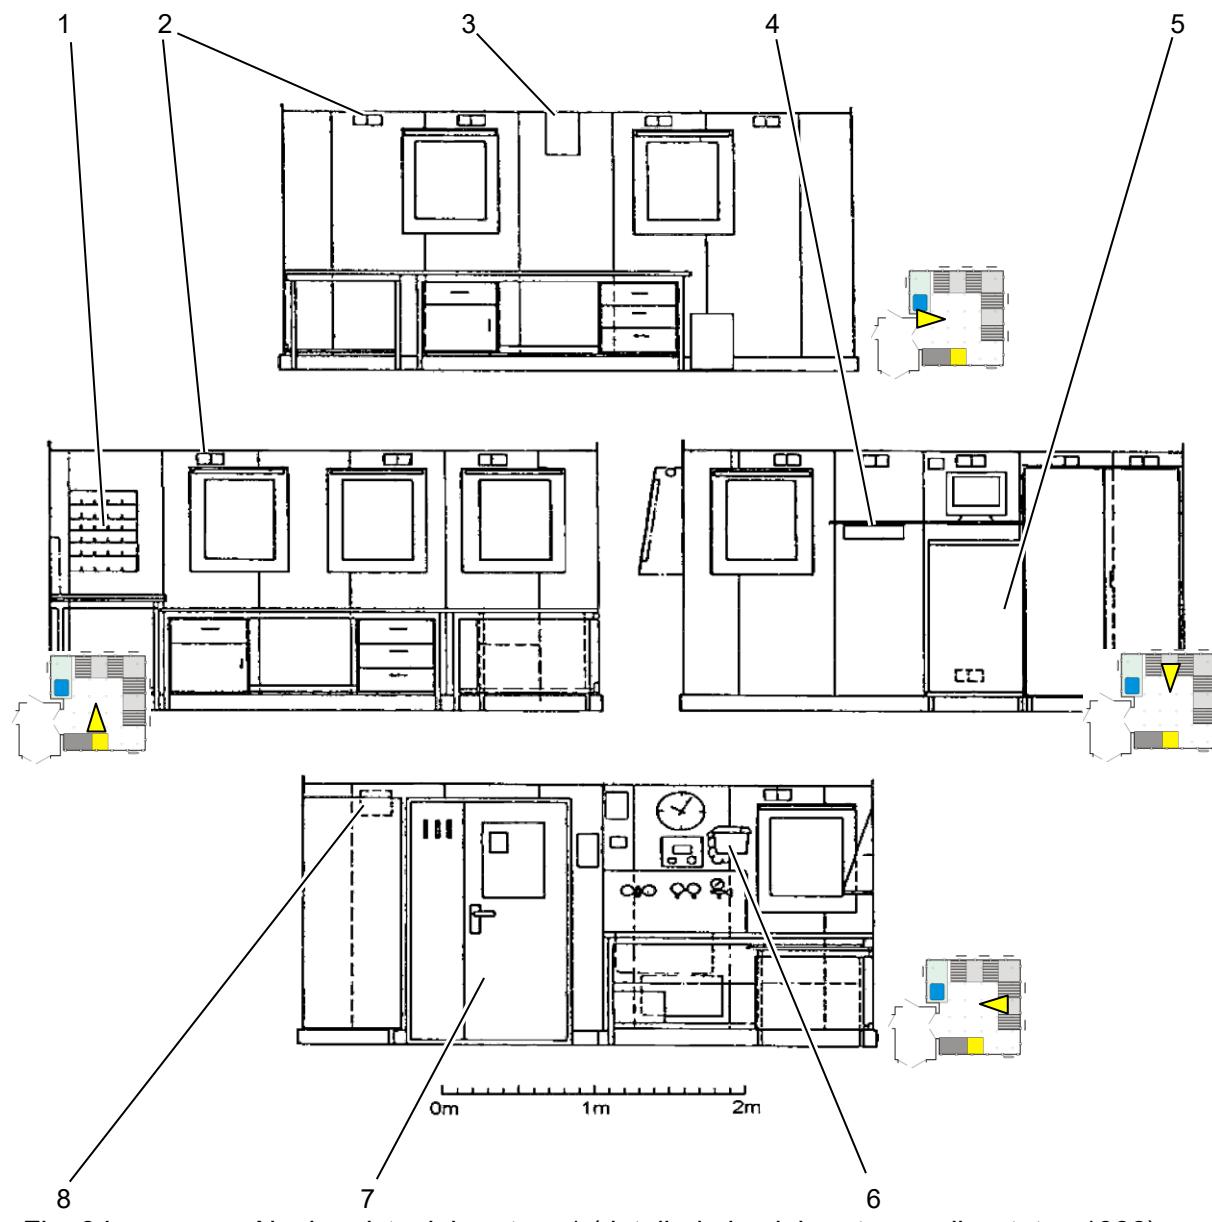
Air chemistry laboratory 1 (detailed plan laboratory walls, status 1986)
